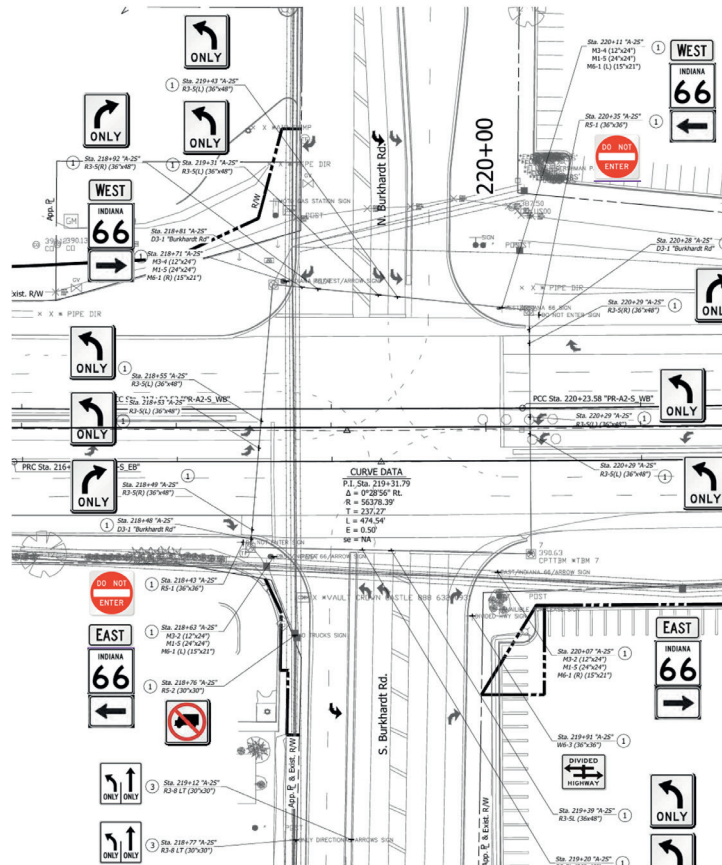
Example Road Plan Document From INDOT for Traffic Sign Placements.
